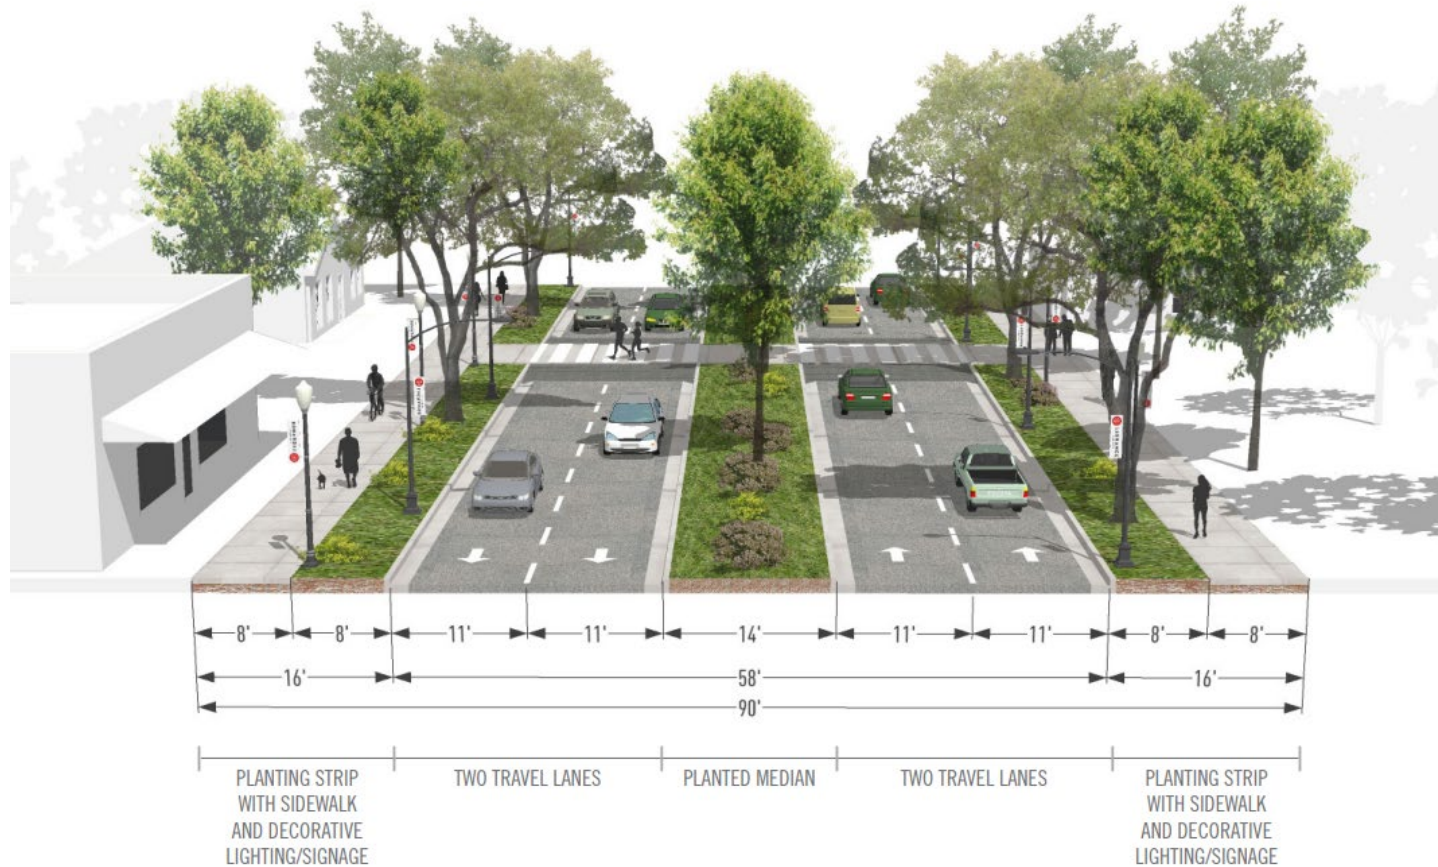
Recommendations for Hamilton Road from I-85 to Whitesville Road
